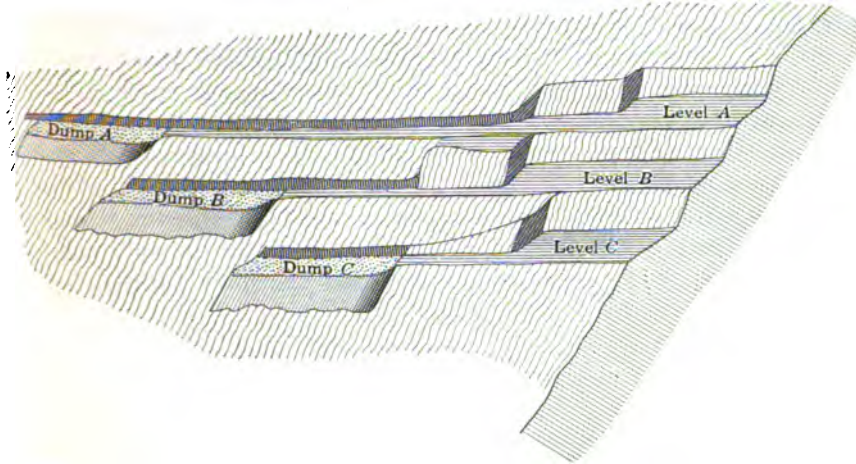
Open-pit terraces or benches in relation to waste dumps. Side-hill position.
